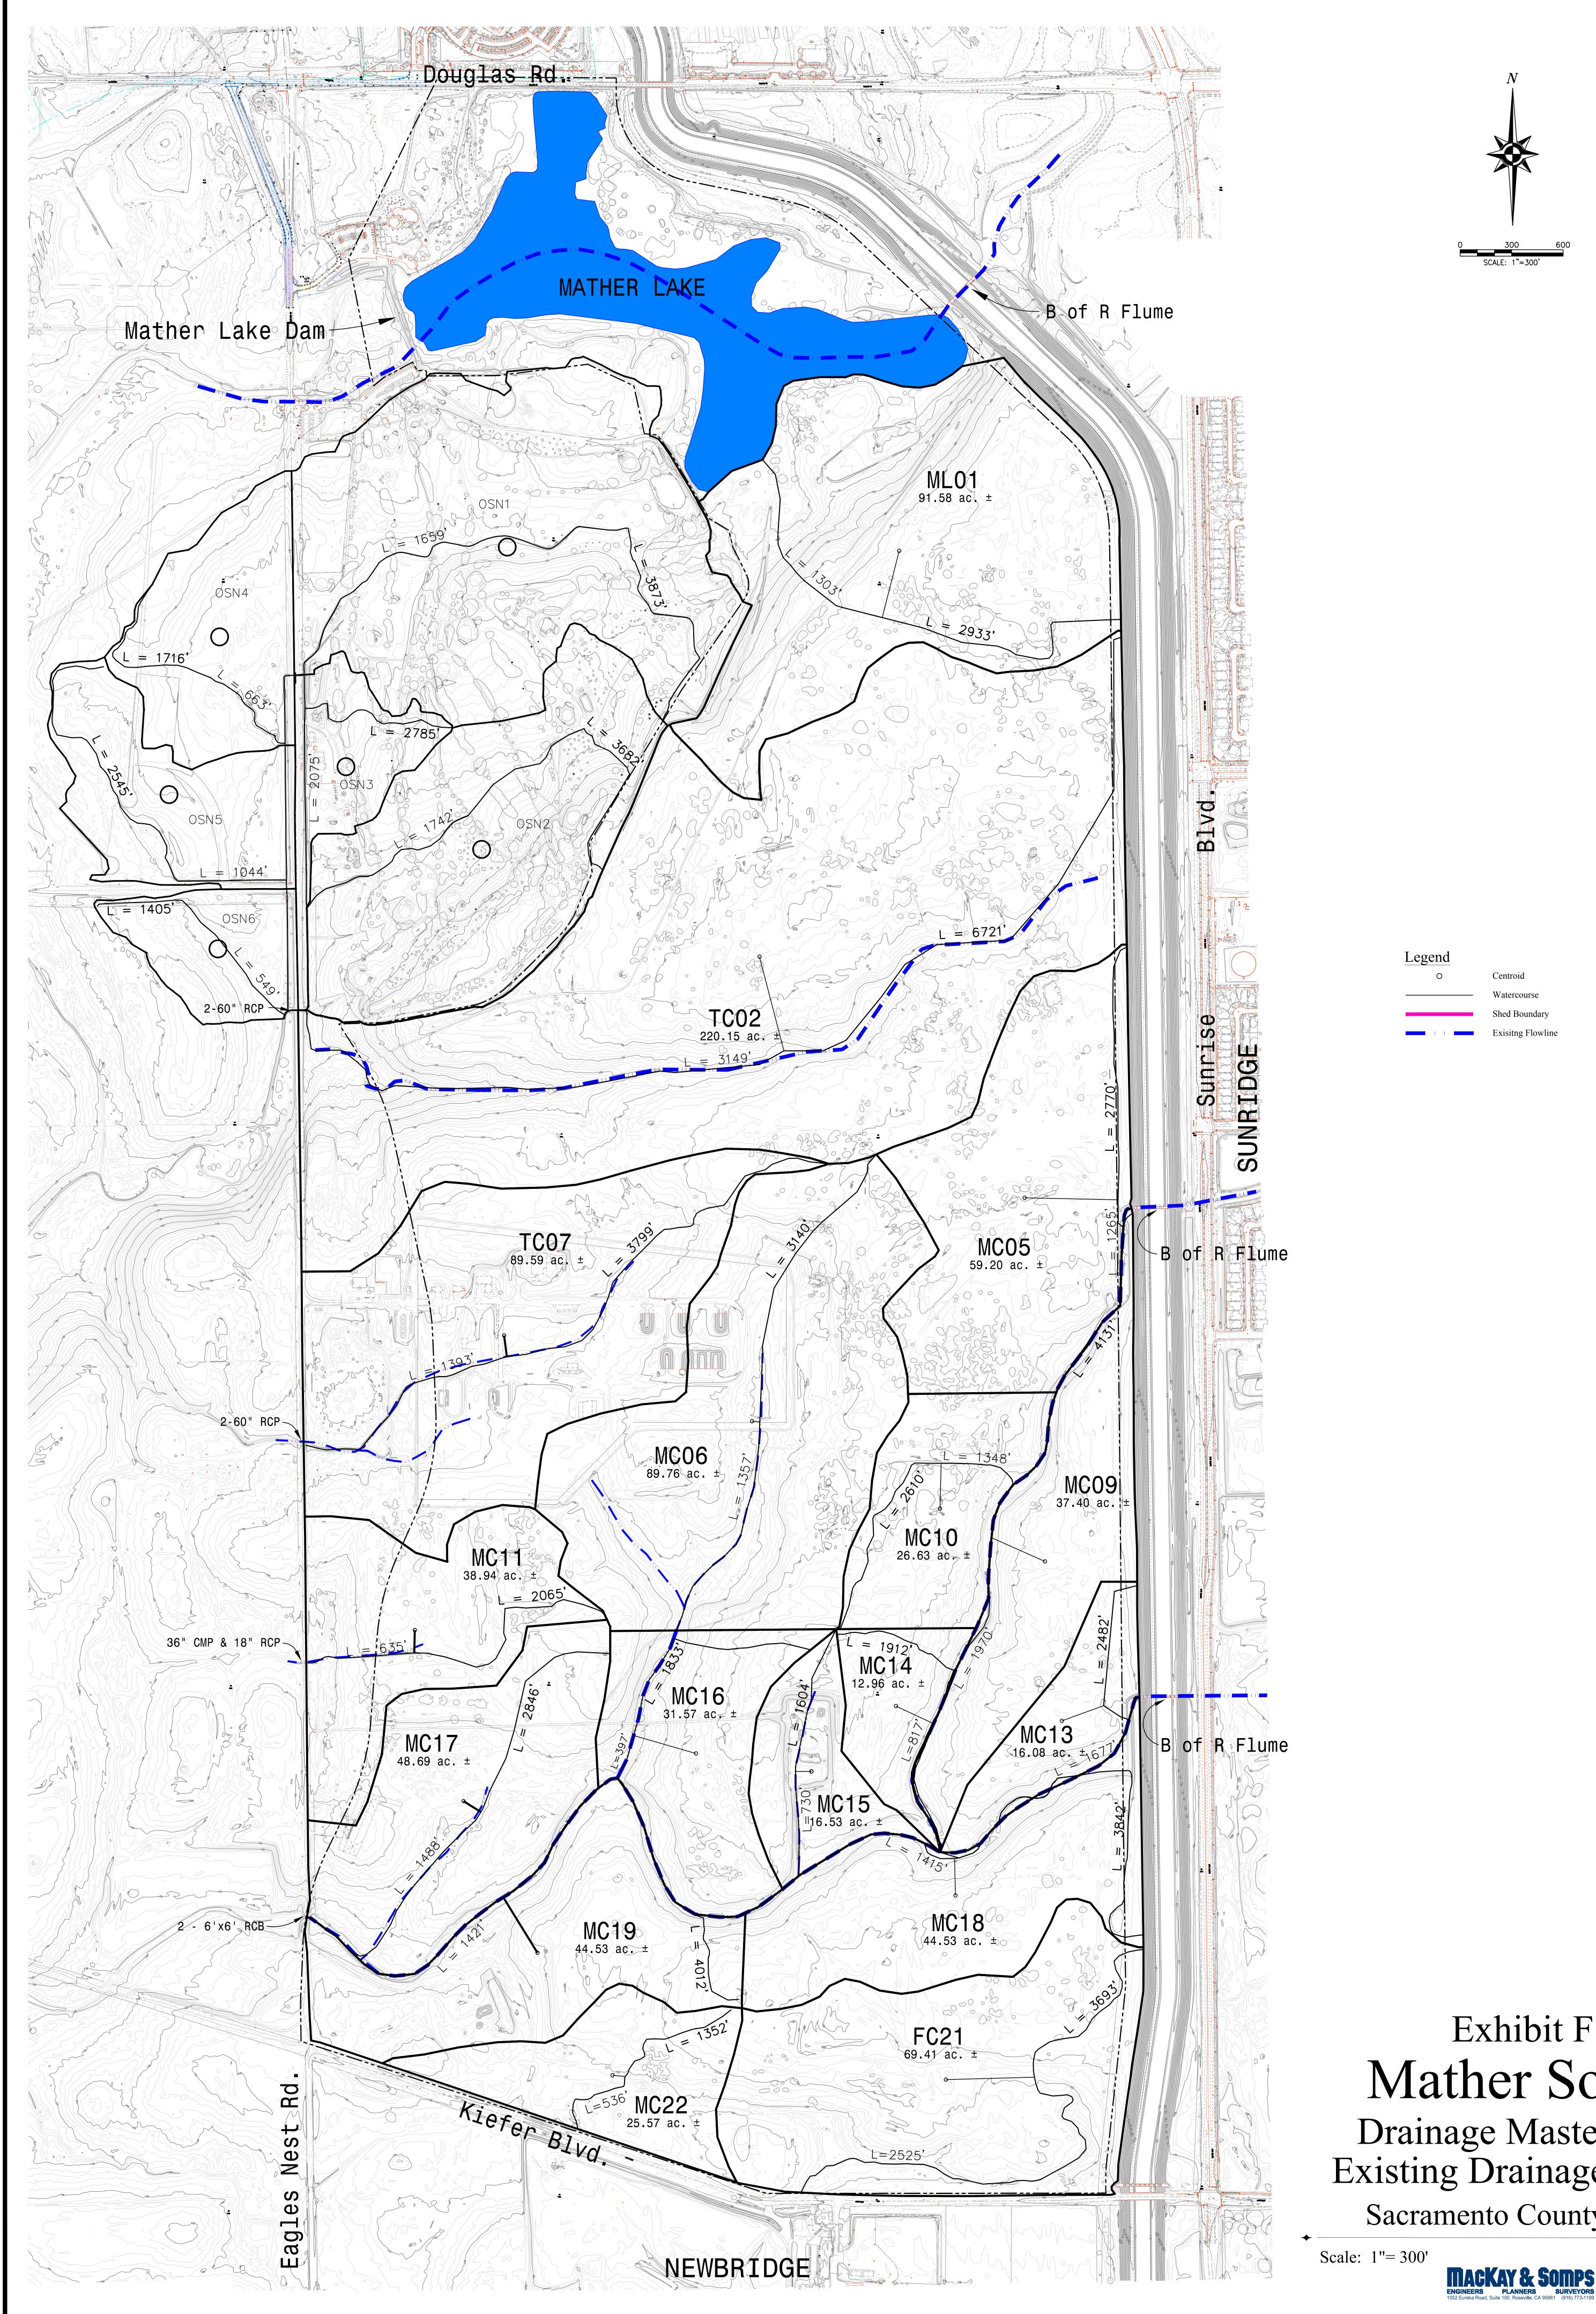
Exhibit F Mather South Drainage Master Plan Existing Drainage Sheds Sacramento County, CA. April, 2017
